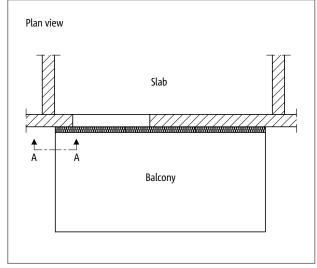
Schöck Isokorb® T type K: Diagram of the position of Section A-A
